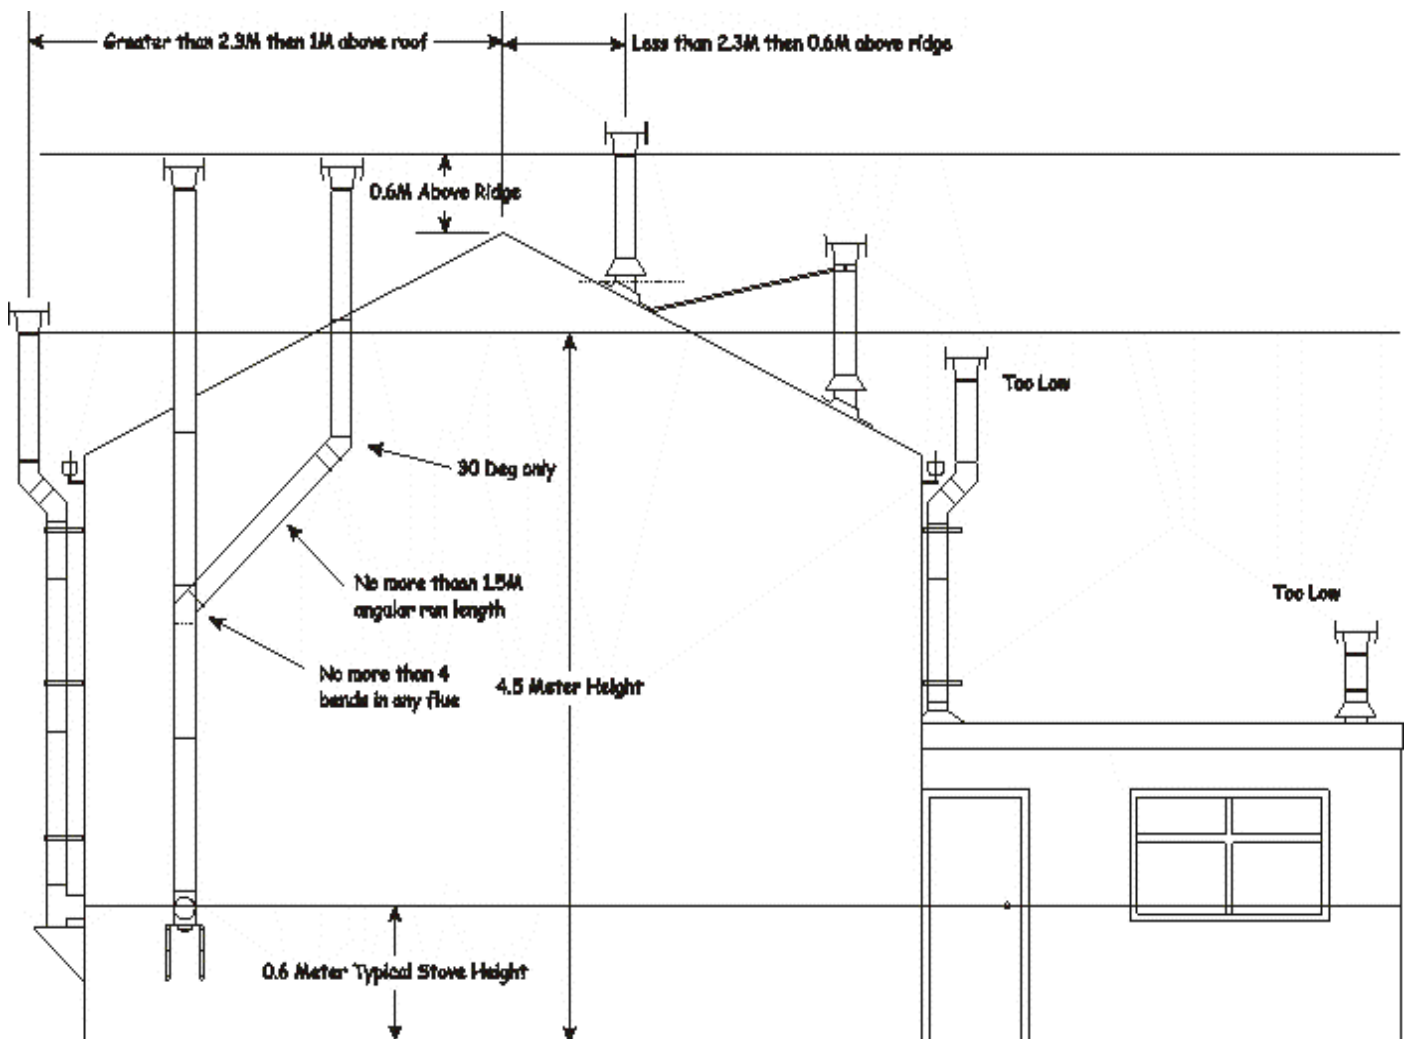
is shown for guidance only, for full and detailed fitting instructions, refer to twin wall manufacturers instructions.
